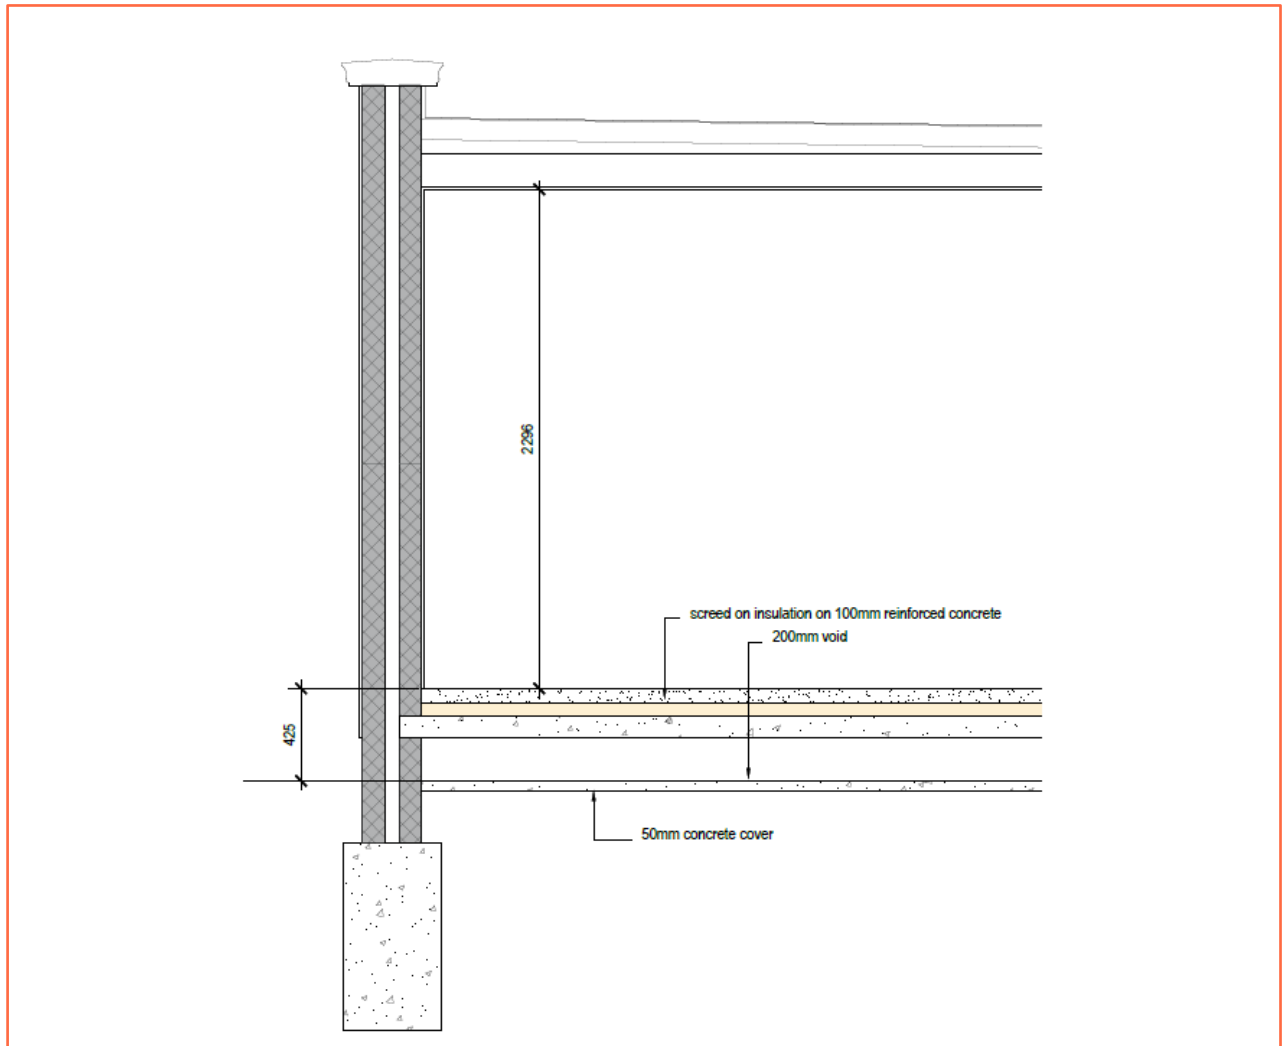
Proposed void with ground floor finished floor level (Source: bpm architects)
